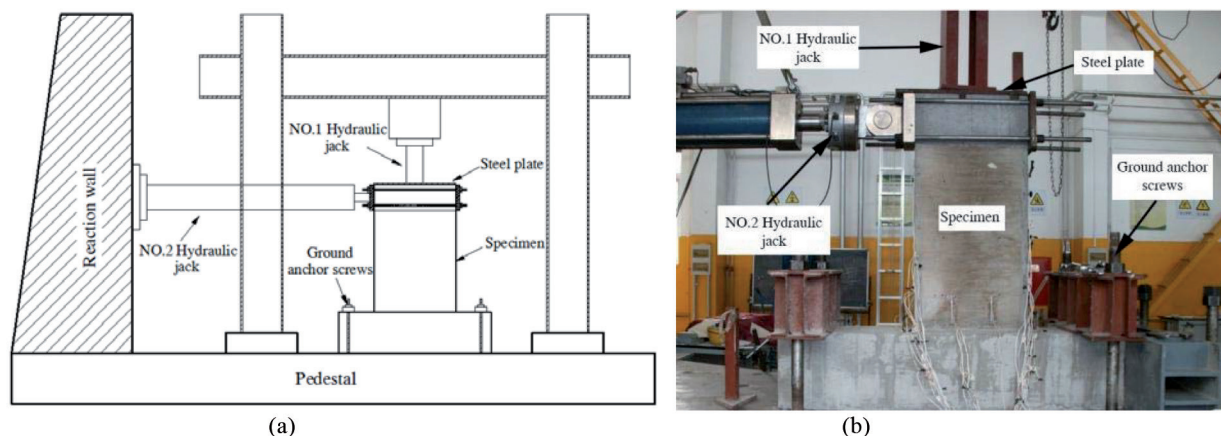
Setup of the composite sample on the test machine. (a) Schematic, (b) Photograph
